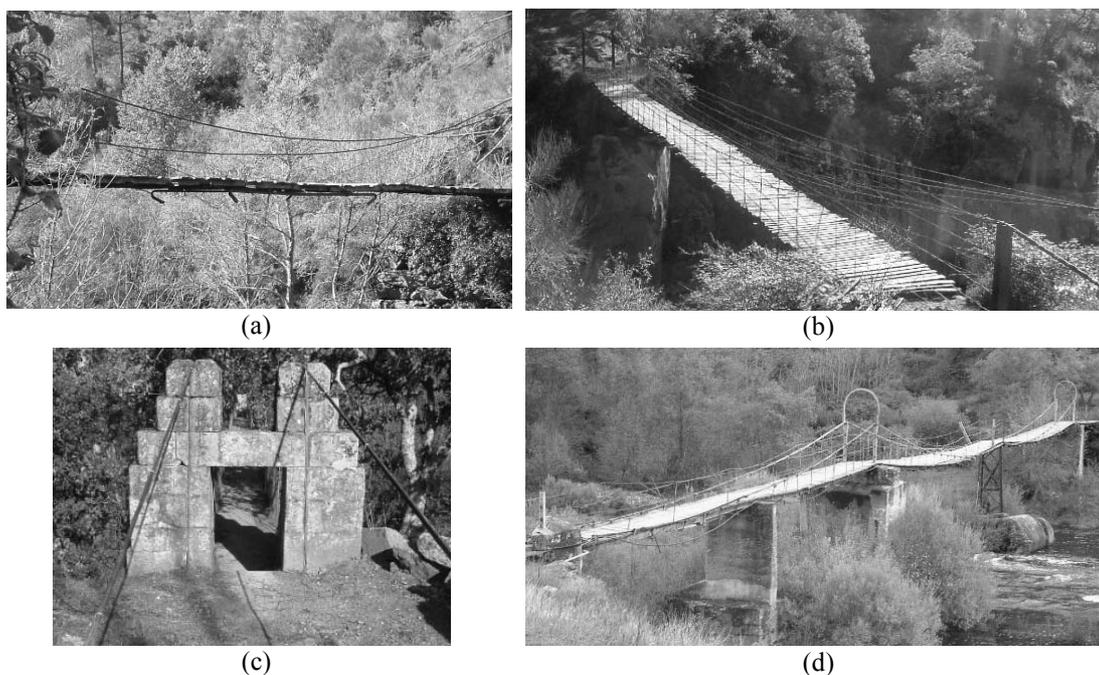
(a) Gardunho bridge; (b) Veral bridge; (c) Santo Aleixo bridge; (d) Cabos bridge.
